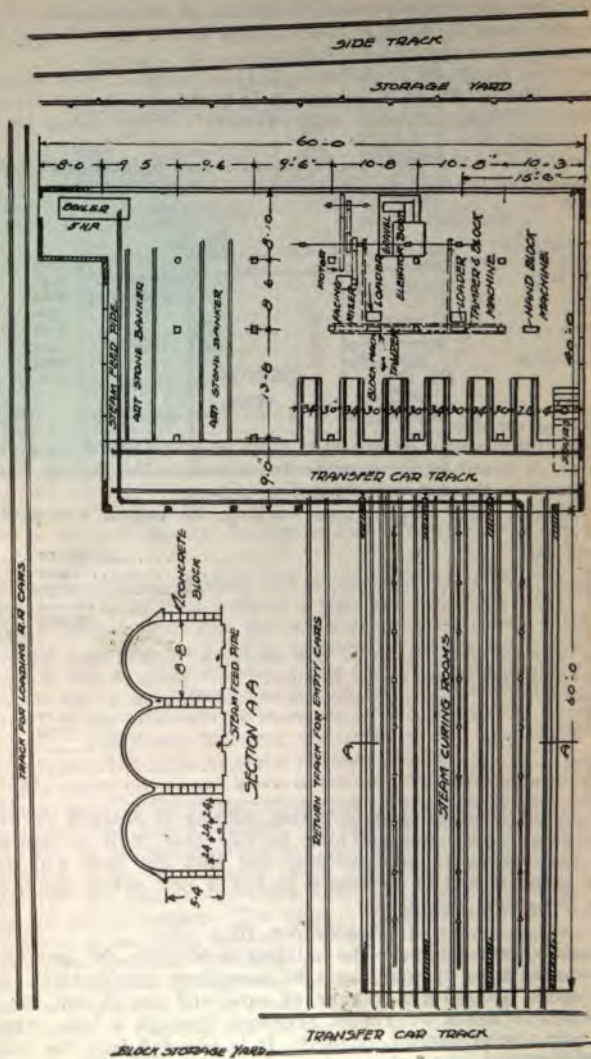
FIRST FLOOR PLAN, PLANT NO. 6
